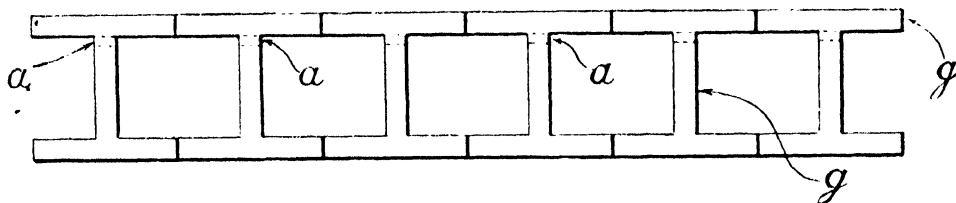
Type of concrete forms suitable for thin walls, tanks, etc.
